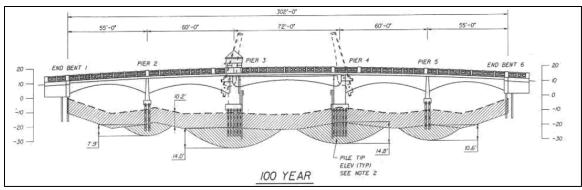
Venetian Causeway Bridge 1 (8DA14373), Profile of Bascule Span
